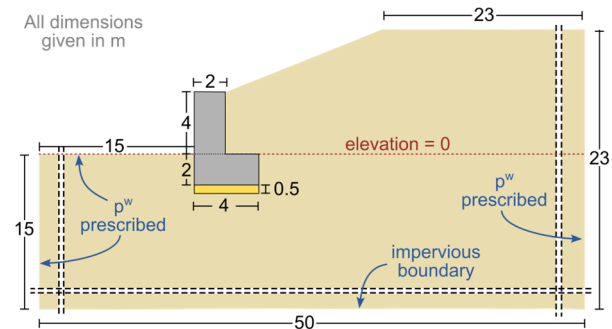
Retaining wall benchmark: Geometry and hydraulic boundary conditions
